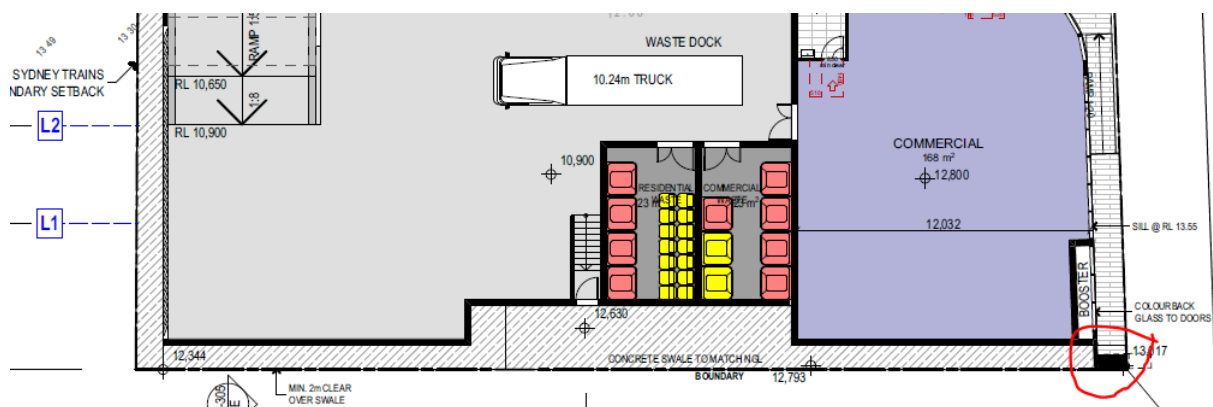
(part) ground floor plan showing location of drainage swale along southern boundary and extension of building façade to southern boundary on Belmore Street frontage
